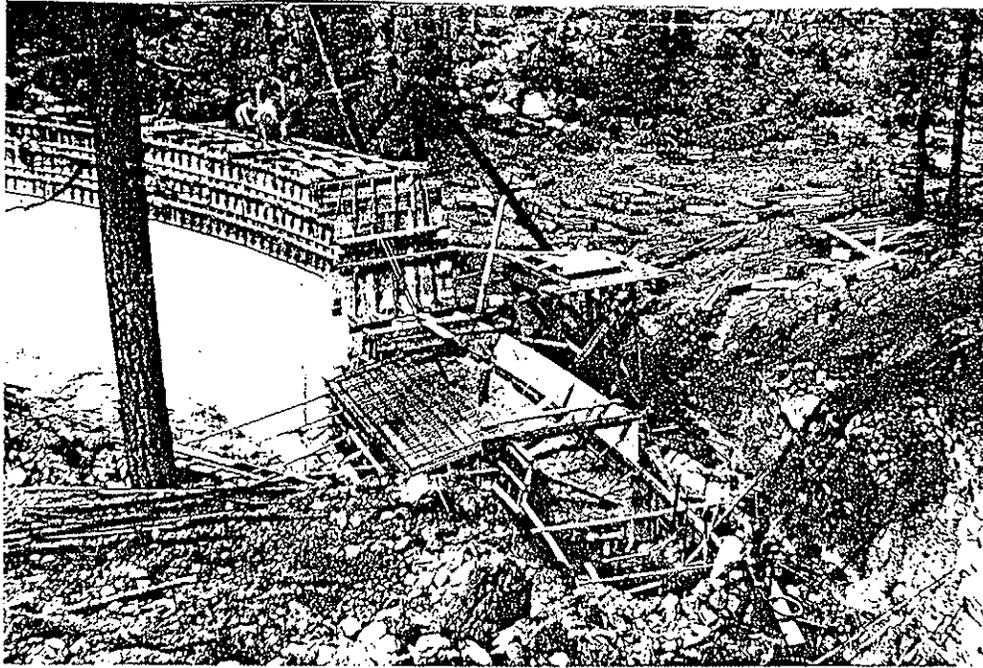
Concrete pouring on Gerber Dam, October 7, 1924. (Bureau of Reclamation Photo No. 566)
